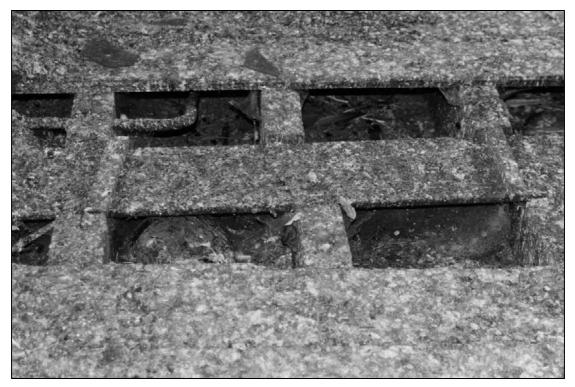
Detail of timber joist and boarded floor of S2 (film 41.21)
